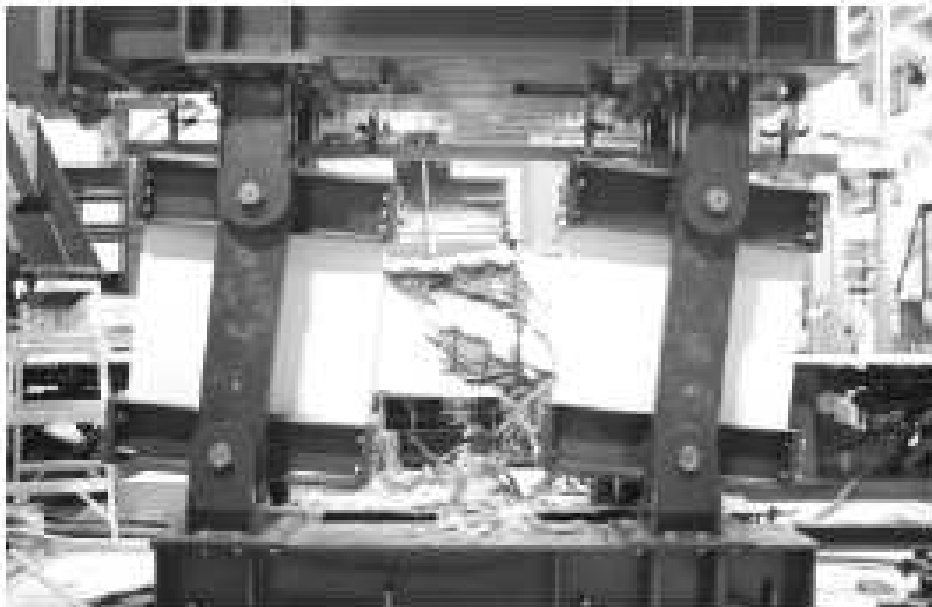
Test Rig with the Coupling Beam Specimen (Baczowski and Kuang, 2008)
